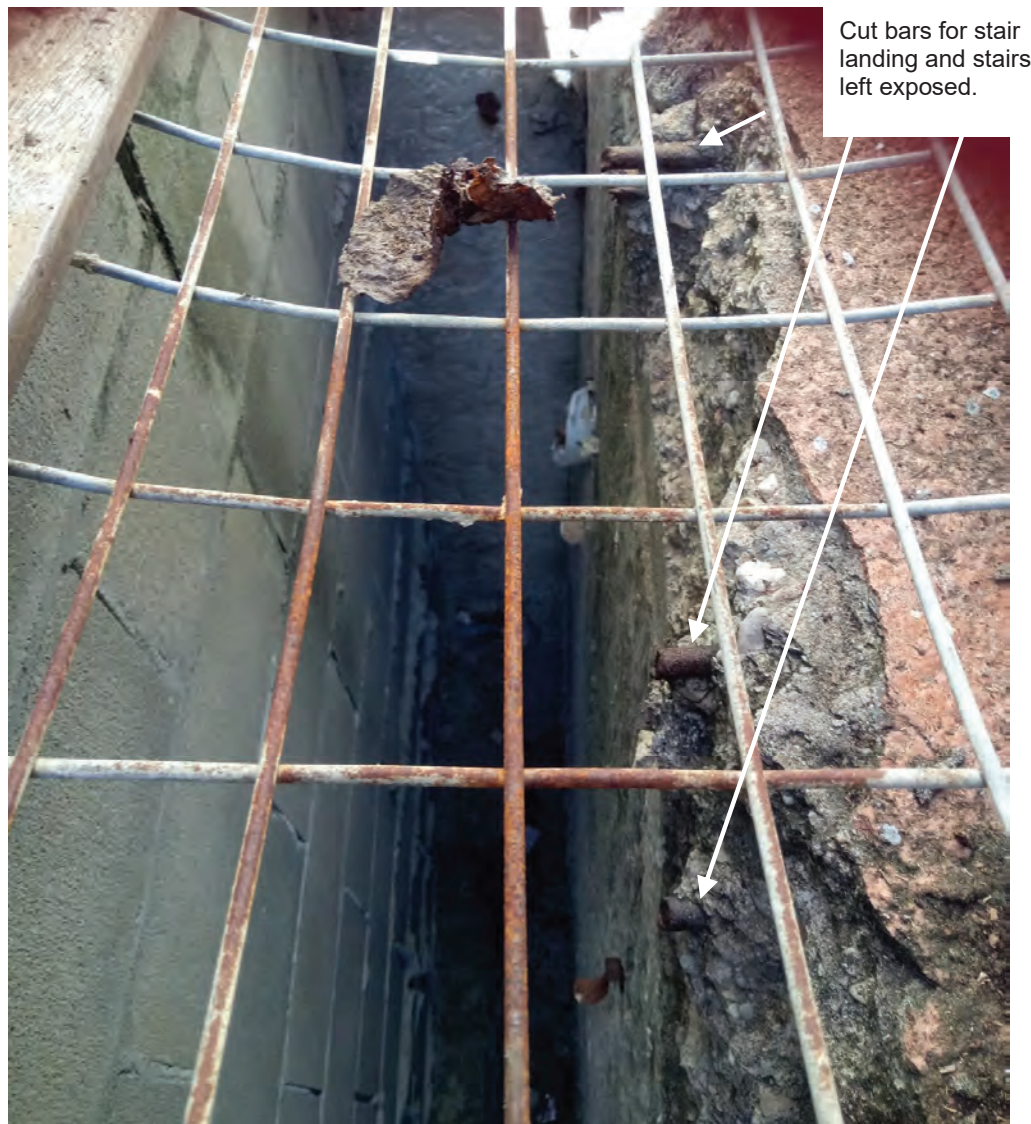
Top view looking down at original rear retaining/stair wall on the right. Note cut exposed reo.
